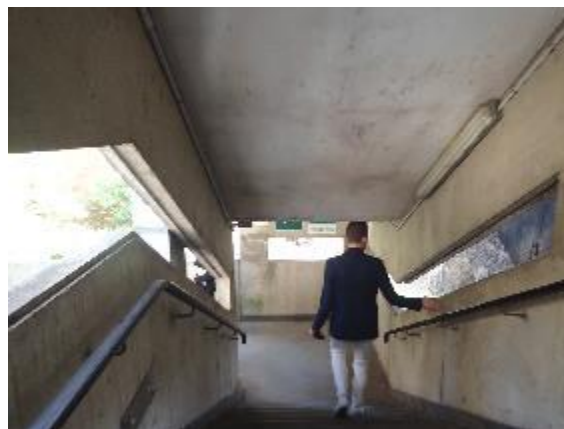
Detail of the stairs from the bridge to ground floor. Note the roof structure is different than the bridge crossing, most likely that this section of the roof was part of the original construction.
